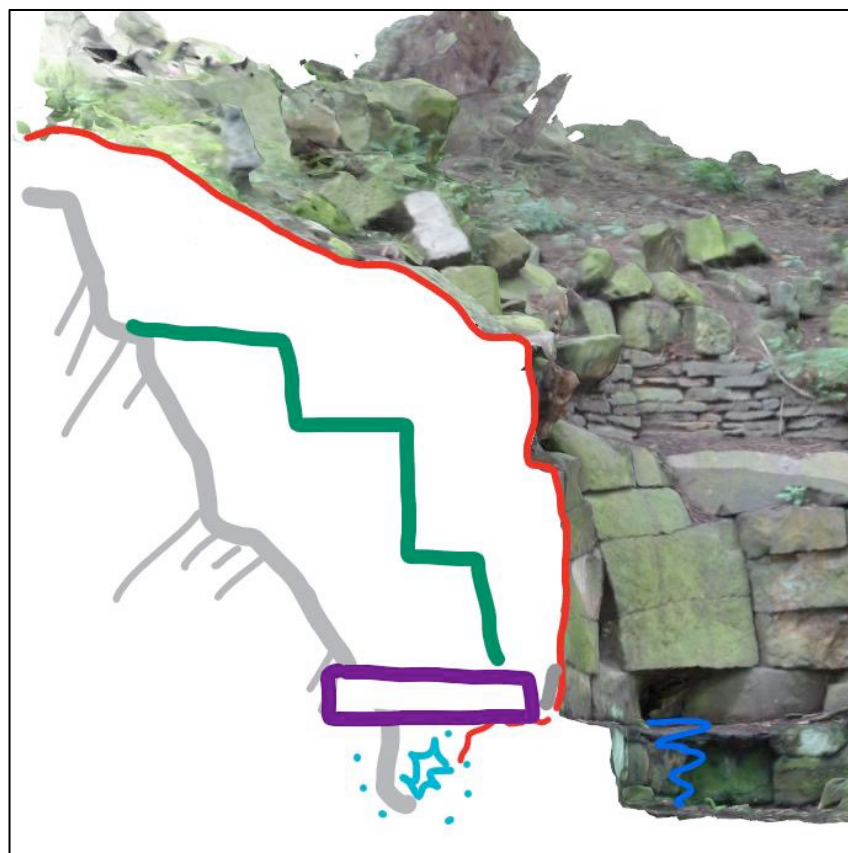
Cross section showing proposed new concrete lintel (purple) and benched bank core (green)
